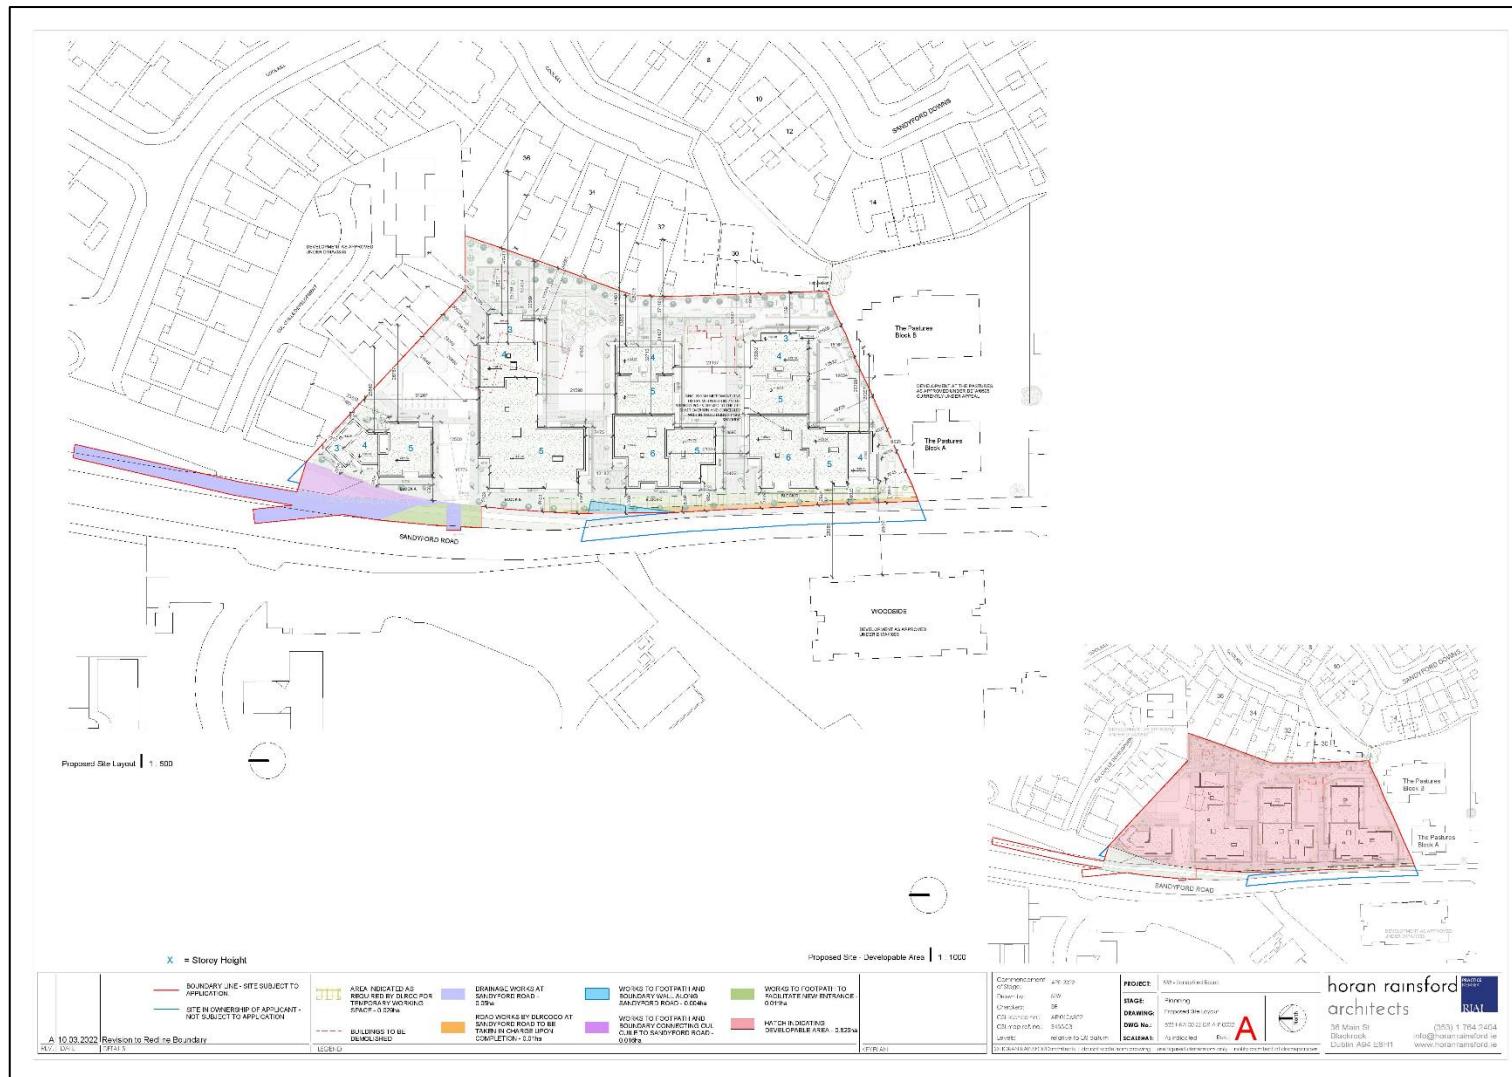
Proposed Site Layout (Horan Rainsford Architects)
